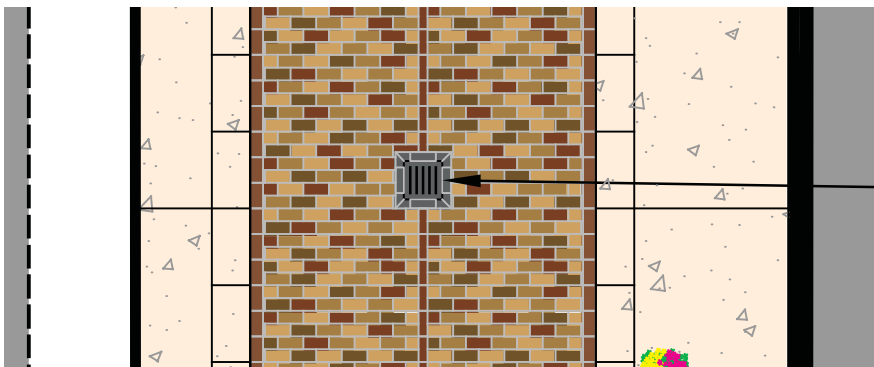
FIGURE G | Brick street enlargement, noting placement of brick along flush curb, around storm inlet, and along center of cartway. Example shown above is Spanish Street, north of Cuna Street.
